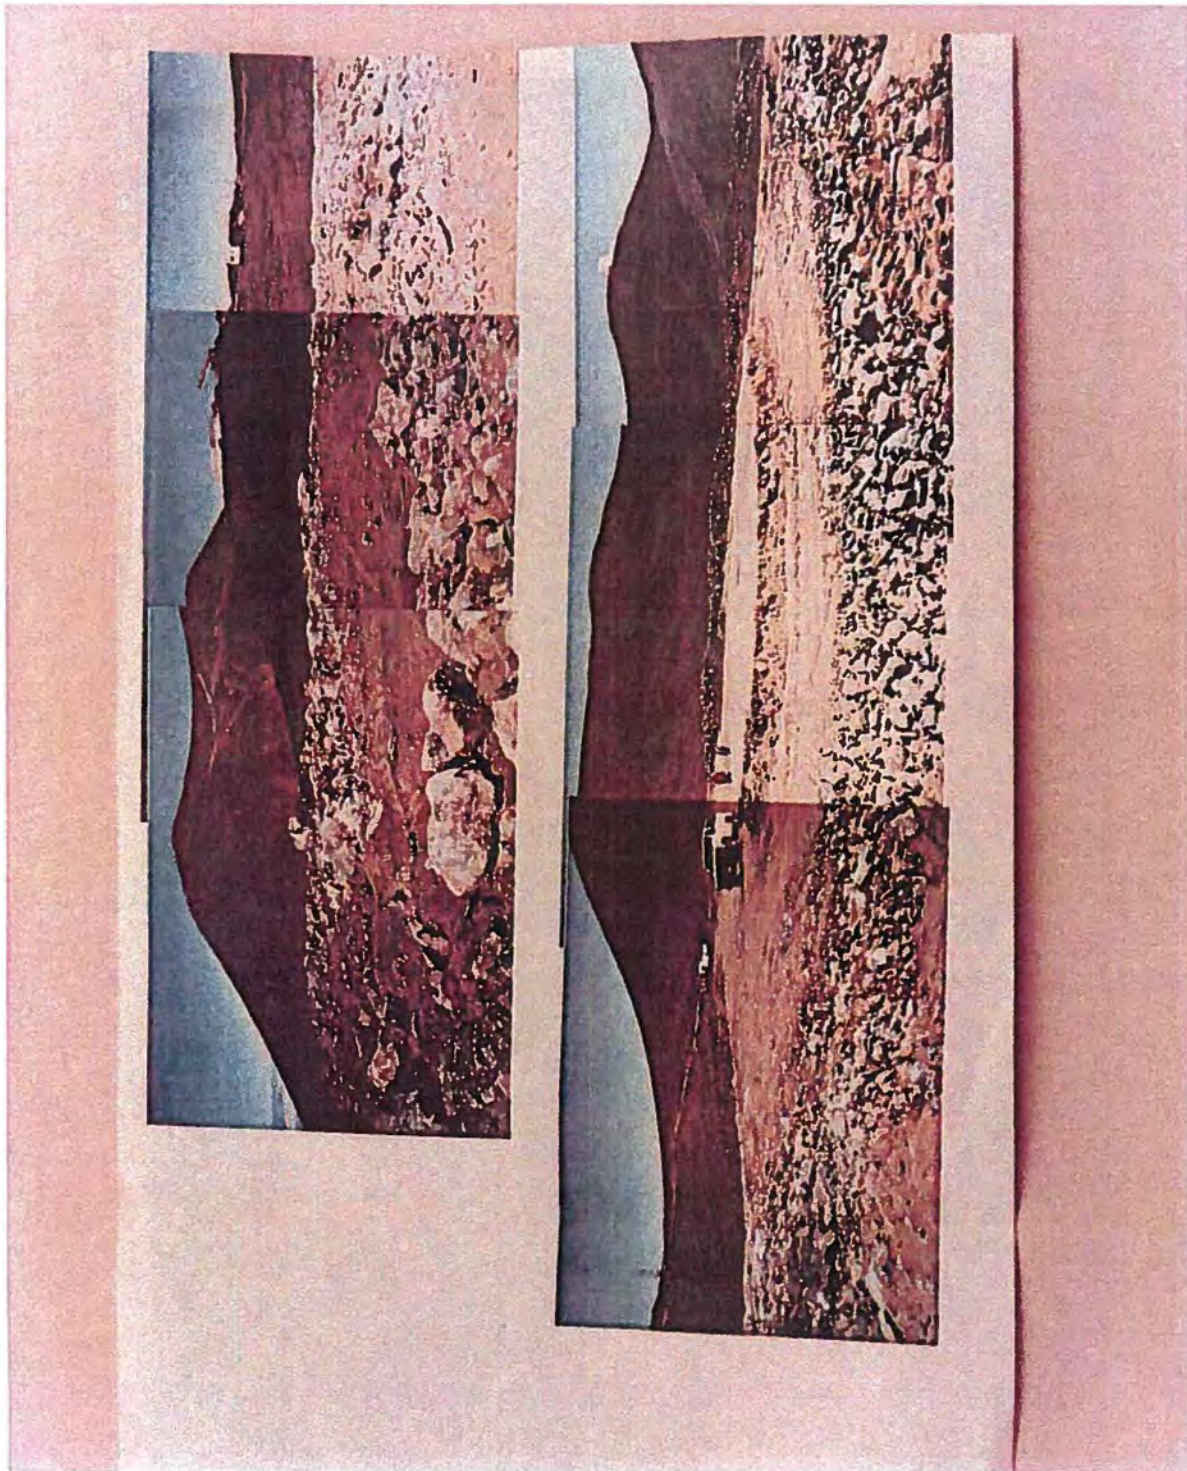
Panoramic photographs of CSO site before (left) and after (right) grading and construction of foundations for the dome and telescope.
